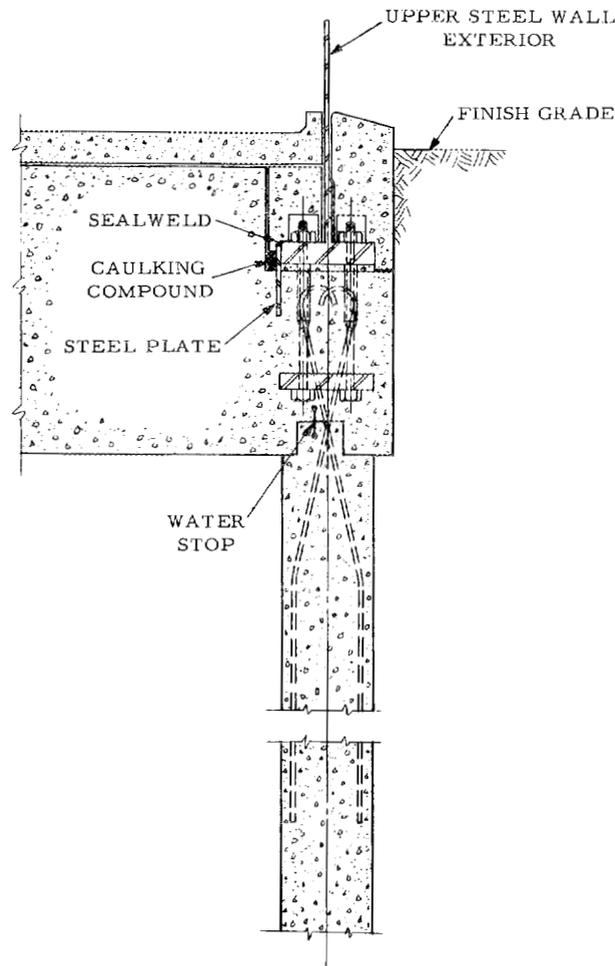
HWCTR Concrete Wall and Steel Joint at Grade. (From ref. 25, Exhibit E)
